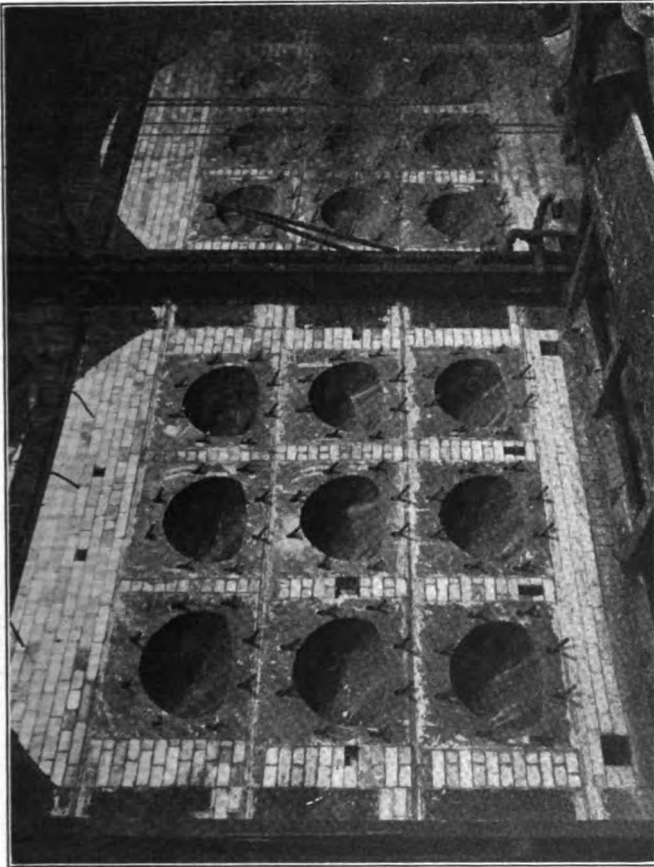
Mouthpiece lower end of special design sectional silica inclines.
